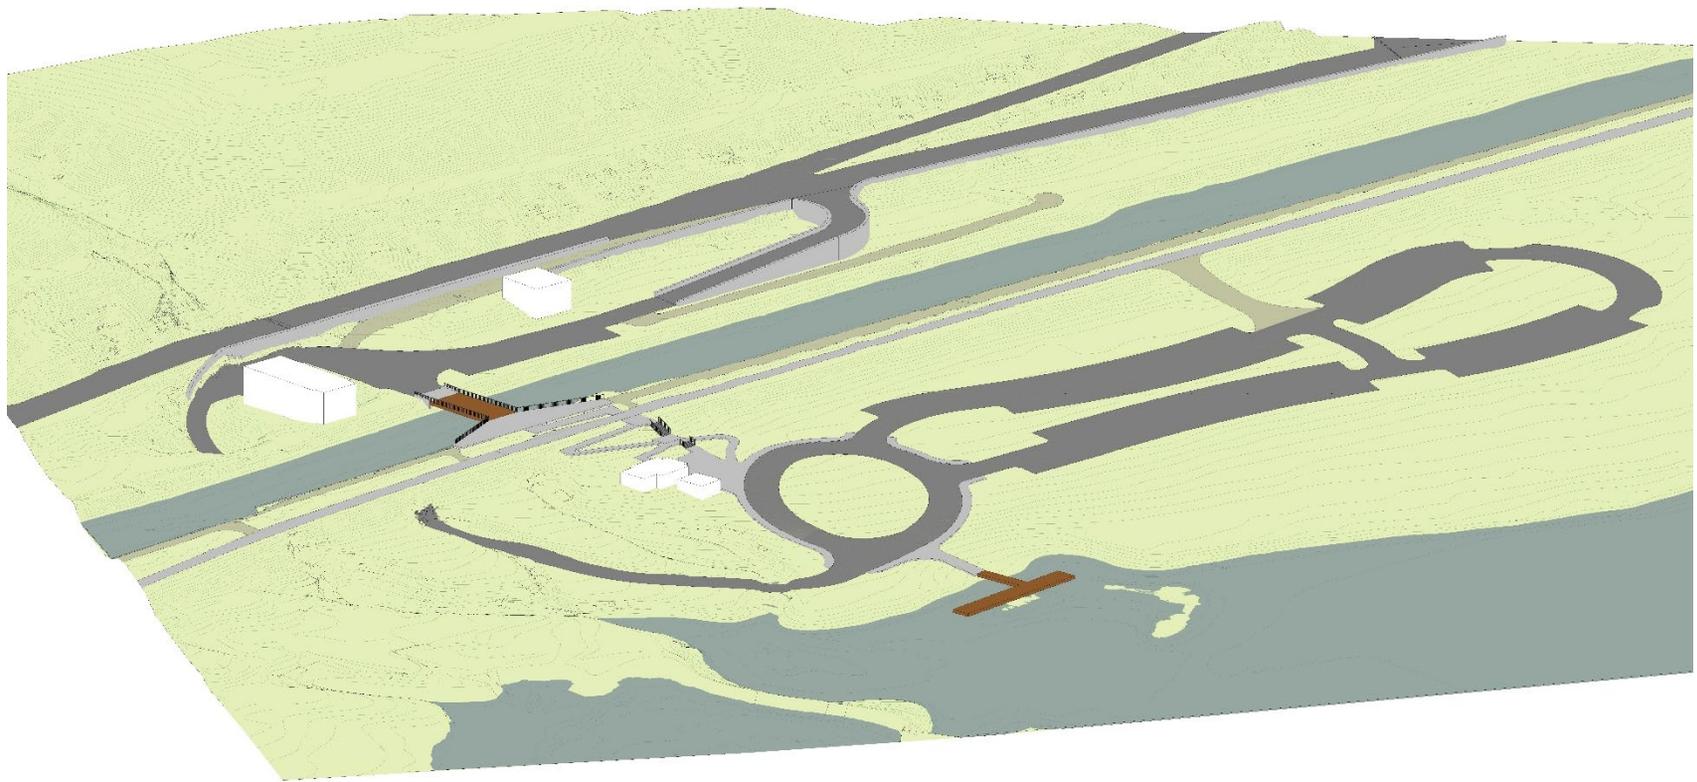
Axonometric View of Upper Parking Lot Access Alternative (Alternative B)
